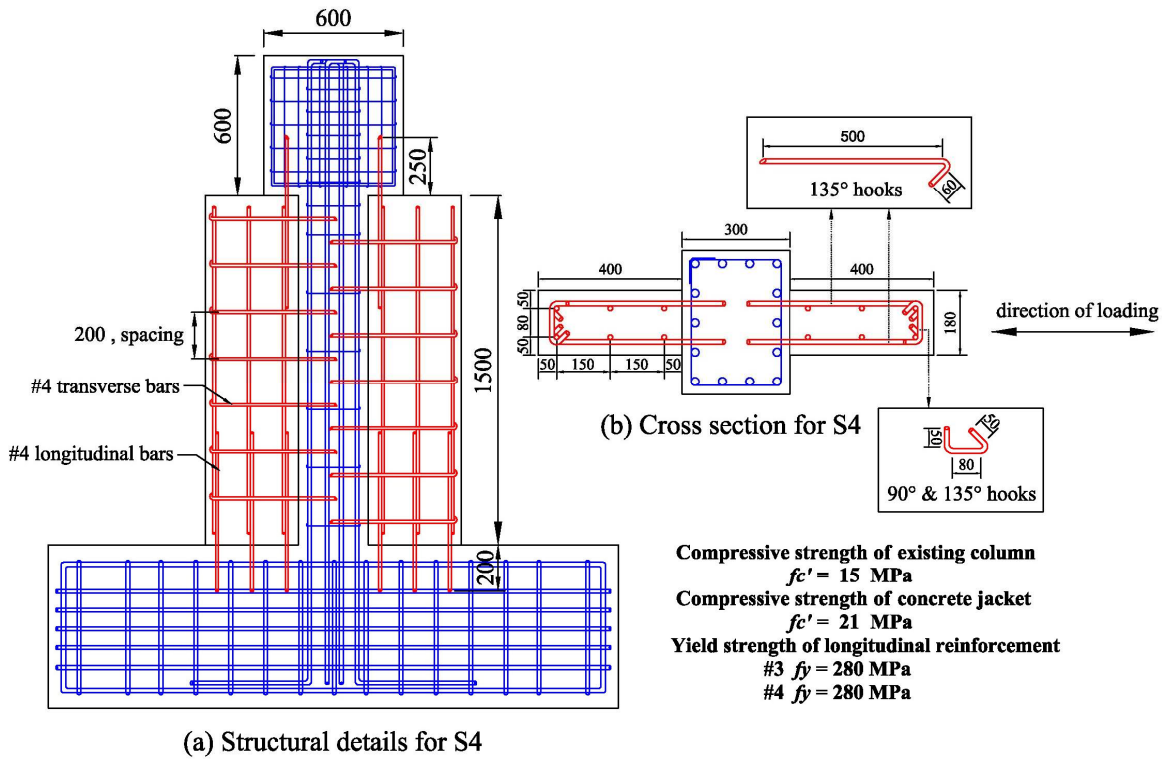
The specimen configuration and details of the substandard column retrofitted by wing walls using Taiwan structural details (unit: mm)
